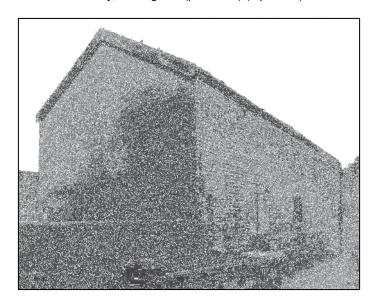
Building A, N gable and W elevation, looking SE (photo 1/11).
